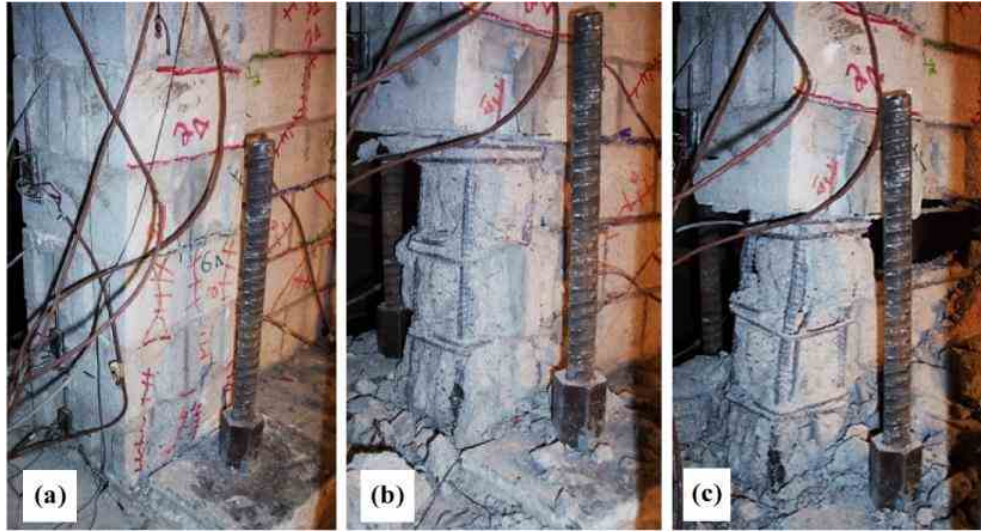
Progression of Failure of East Toe in Wall 8: a) Vertical Cracks Observed ($\Delta\% = -2.63\%$), b) Loss of Face shell in Tension ($\Delta\% = +3.68\%$ 2nd cycle), c) Final Failed State with Crushing in Web and Buckling of Confined Reinforcement
